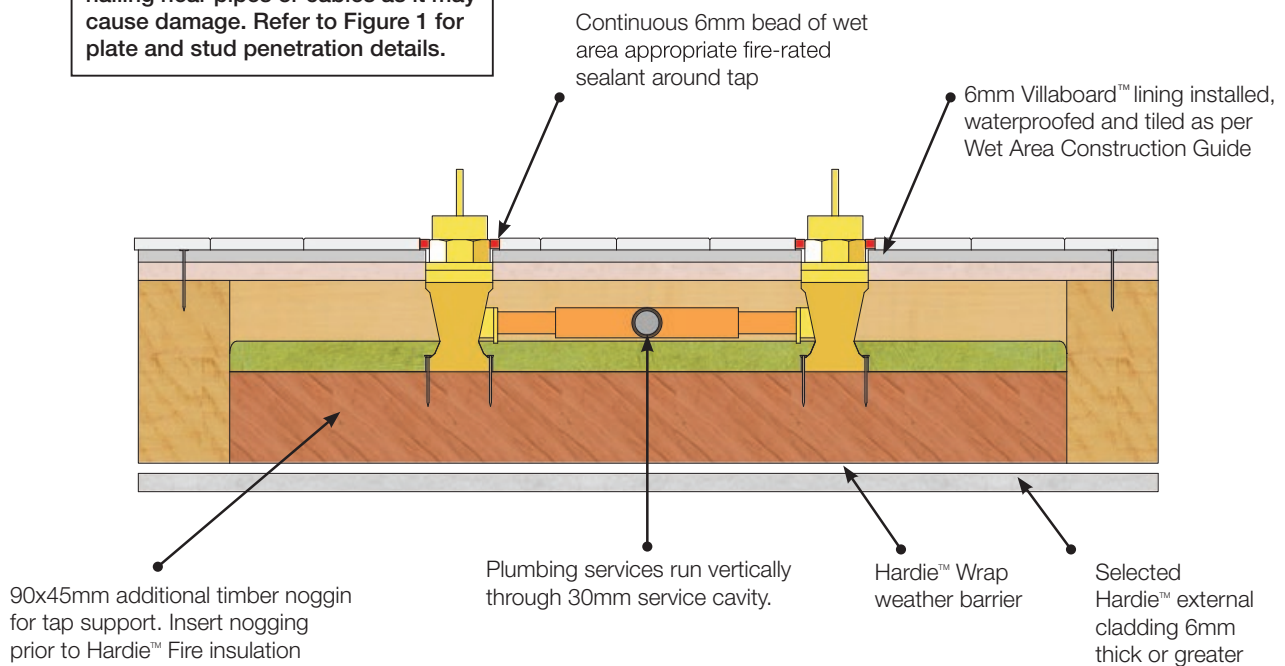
HOT/COLD PLUMBING TAPS - SECTION FROM ABOVE
